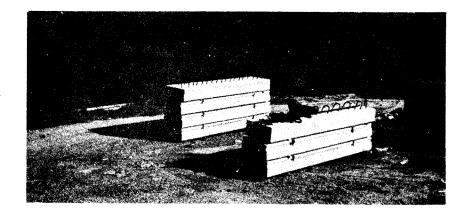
Exterior beam with a few large parapet bars cast in slab.
